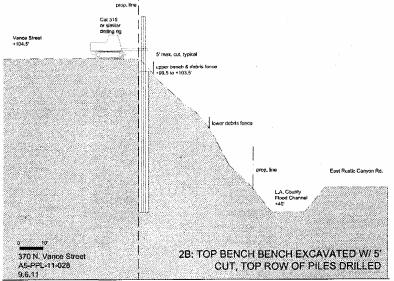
Drilling upper piles stage from "Site Grading and Concrete Pile Construction Sequence" by Robert G. Holcomb II
